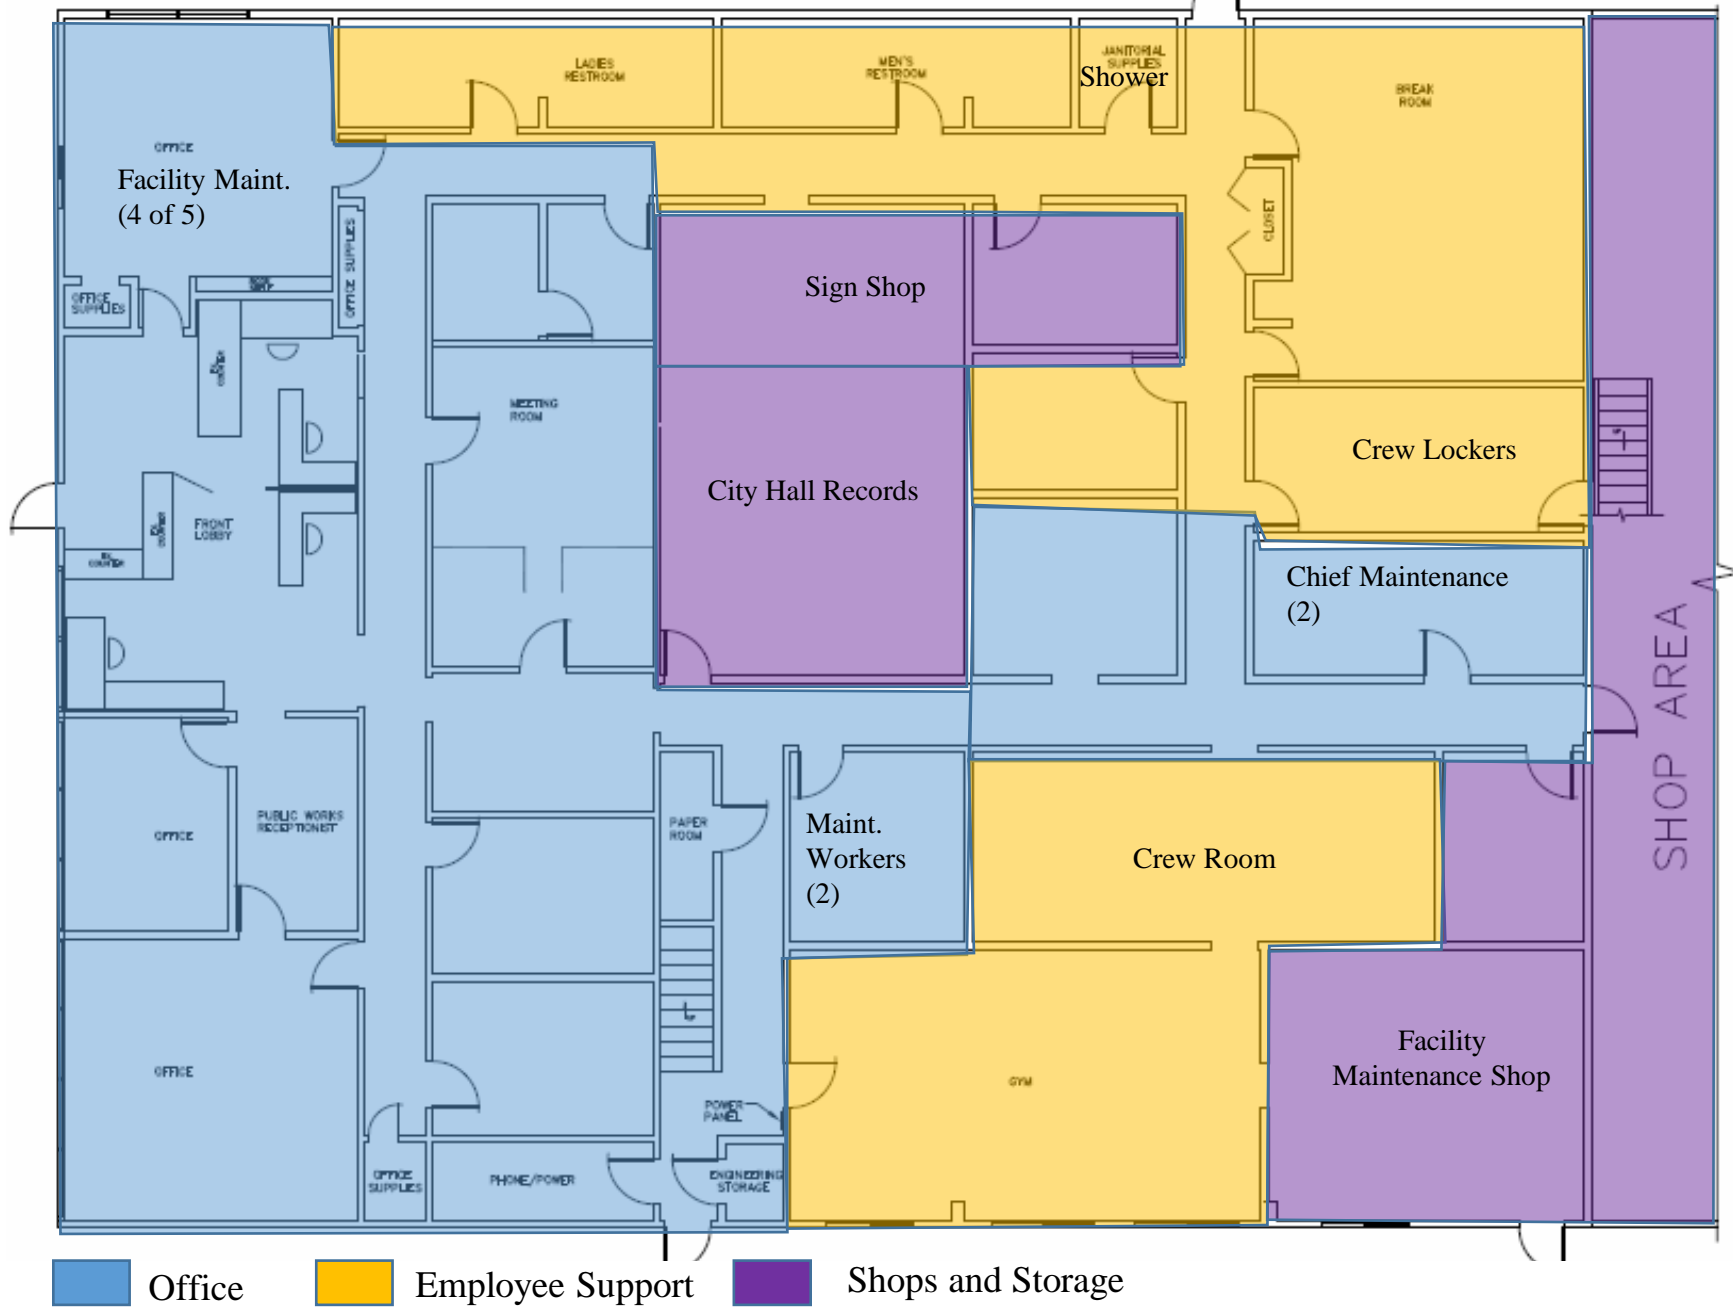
Public Works Operations Building – First Floor Functional Use (1 of 2)
